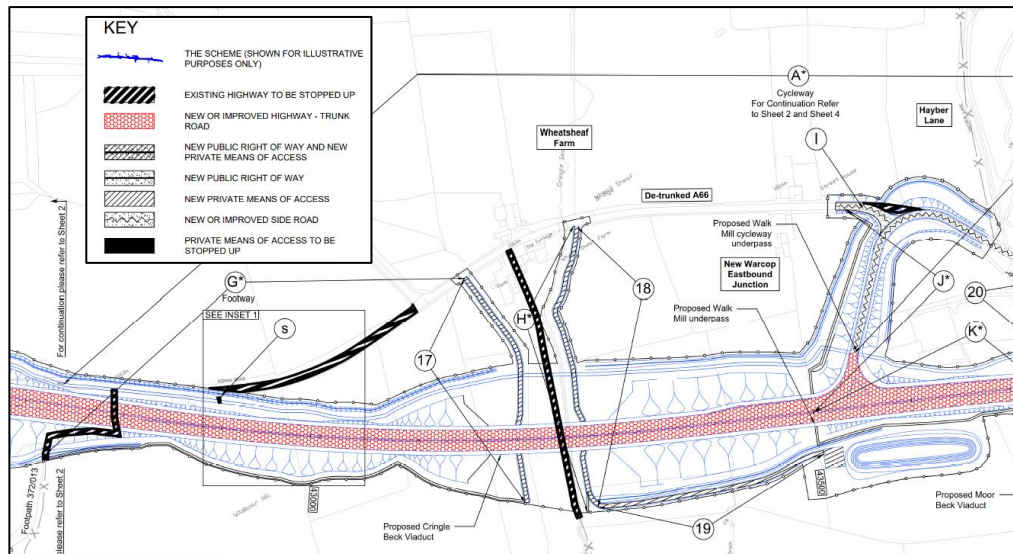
(e) Extract from Rights of Way and Access Plans (Before)
